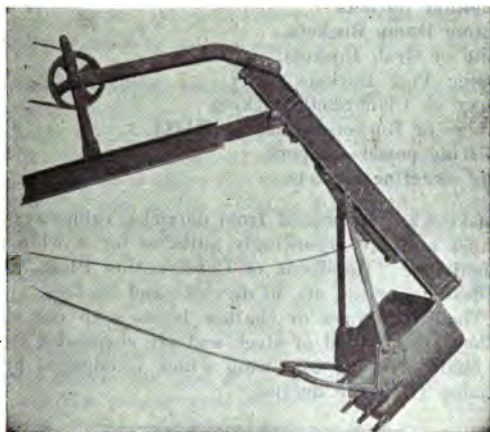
Ditcher Bucket Equipment for Keystone Excavator.
